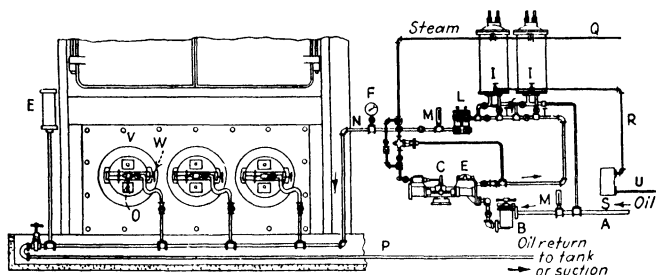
Mechanical-atomizing oil-burning system, completely installed, showing arrangement of pumps, strainers, heaters and accessories.
